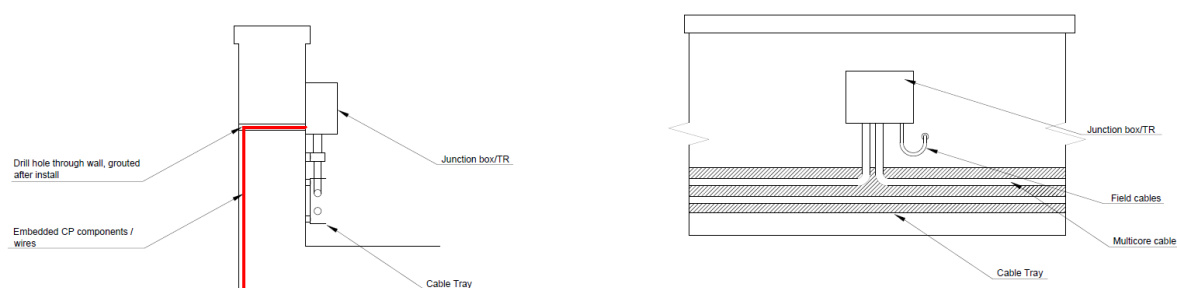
Example of junction boxes & penetrations mounted to rear face of parapets.
